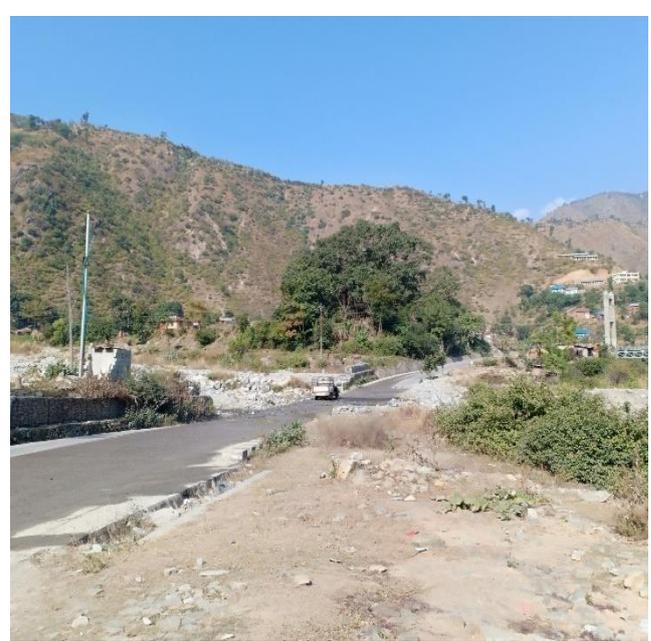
Existing conditions of BP Highway at Mamti Khola crossing (Ch. 113+900)
